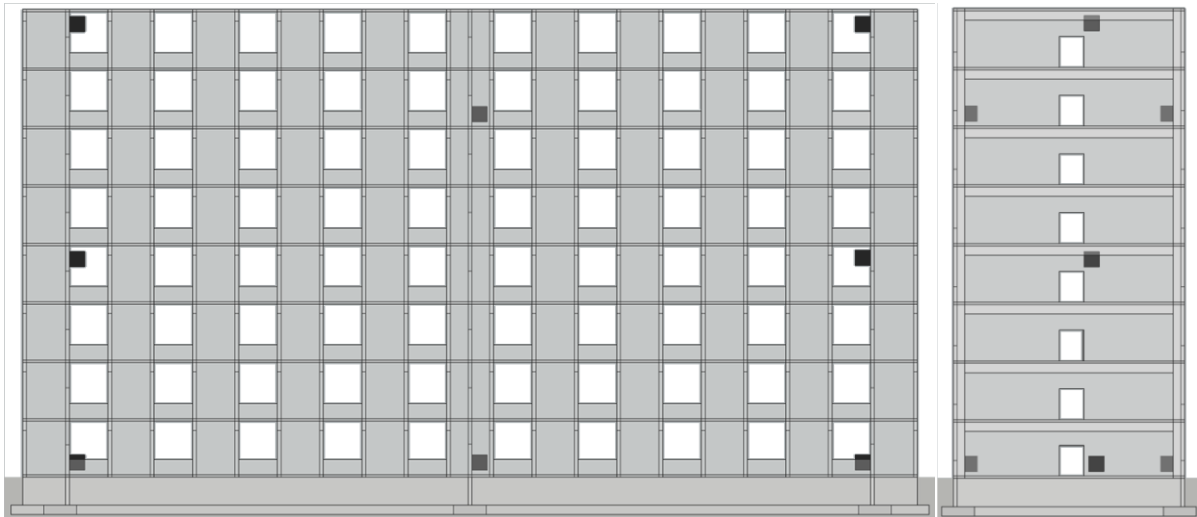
Longitudinal (left) and transverse (right) elevations of the Physics Building with instrument locations.
